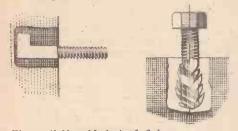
(left).—Method of fixing to stone or concrete walls. Fig. 4 (right)—Rag bolt, used for fixing to floors.
